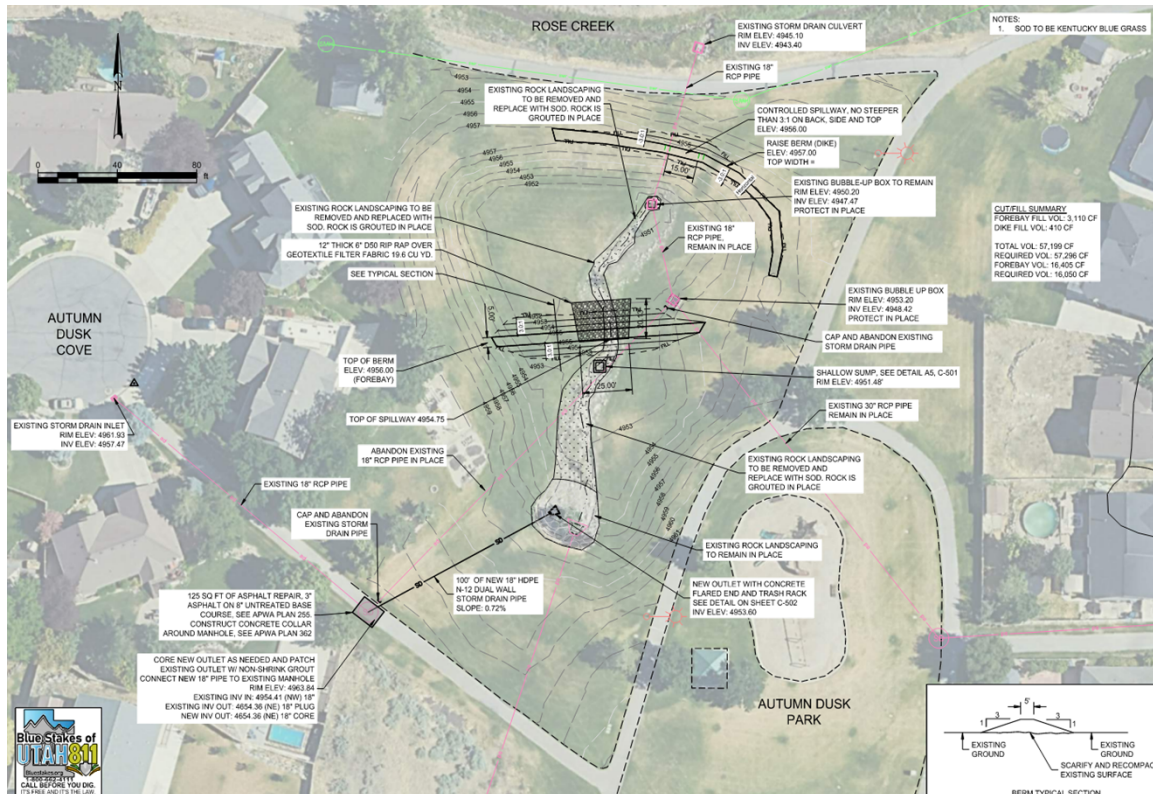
Excerpt from the Autumn Dusk Detention Pond Retrofit Plan
